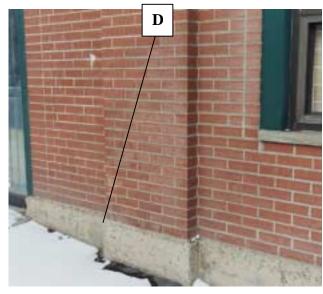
Pier adjacent to former garage opening D – Line between new & old masonry
